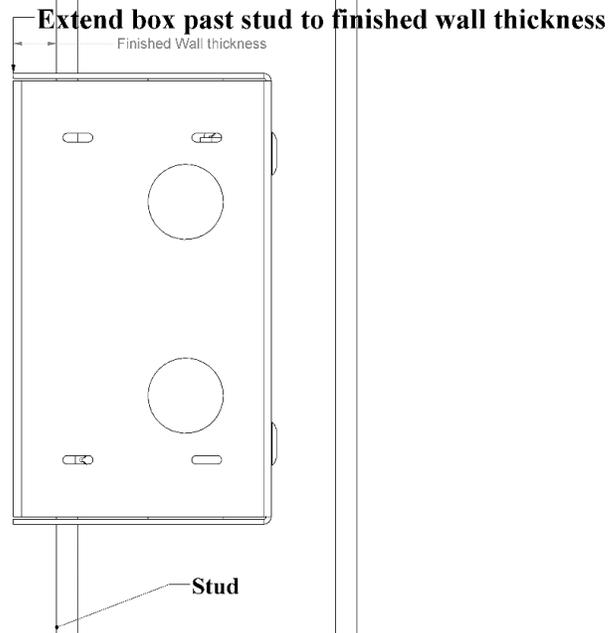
Flush Mount Installation (Protrude to finished wall thickness)
